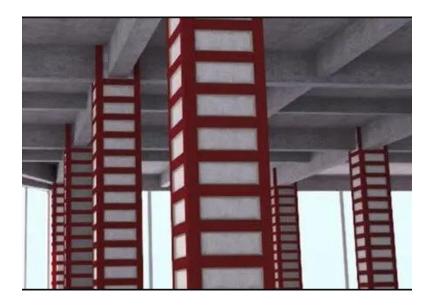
Steel jacketing retrofit for RC column (with steel angles, Chanel, and bands jacketing) (*FRP Jacketing VS Steel Jacketing - Structural Strengthening Method*, no date)
